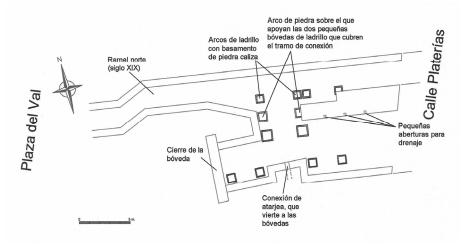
Ground current floor plan of the remains of Costanilla-Platerías Bridge. (STRATO Plan)
